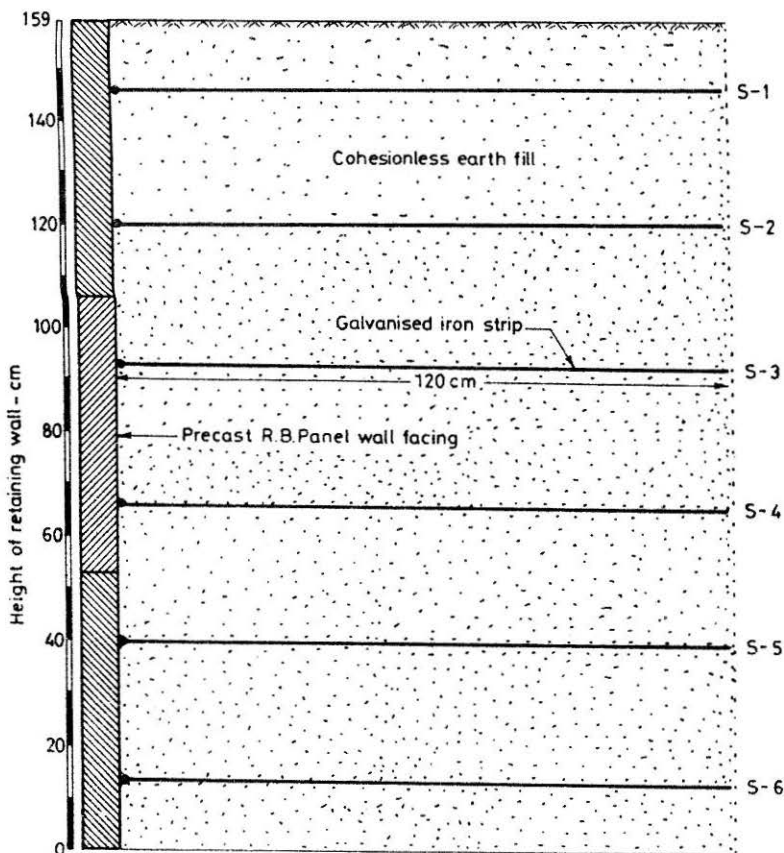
Cross-Section of the Analyzed Reinforced Earth Wall
